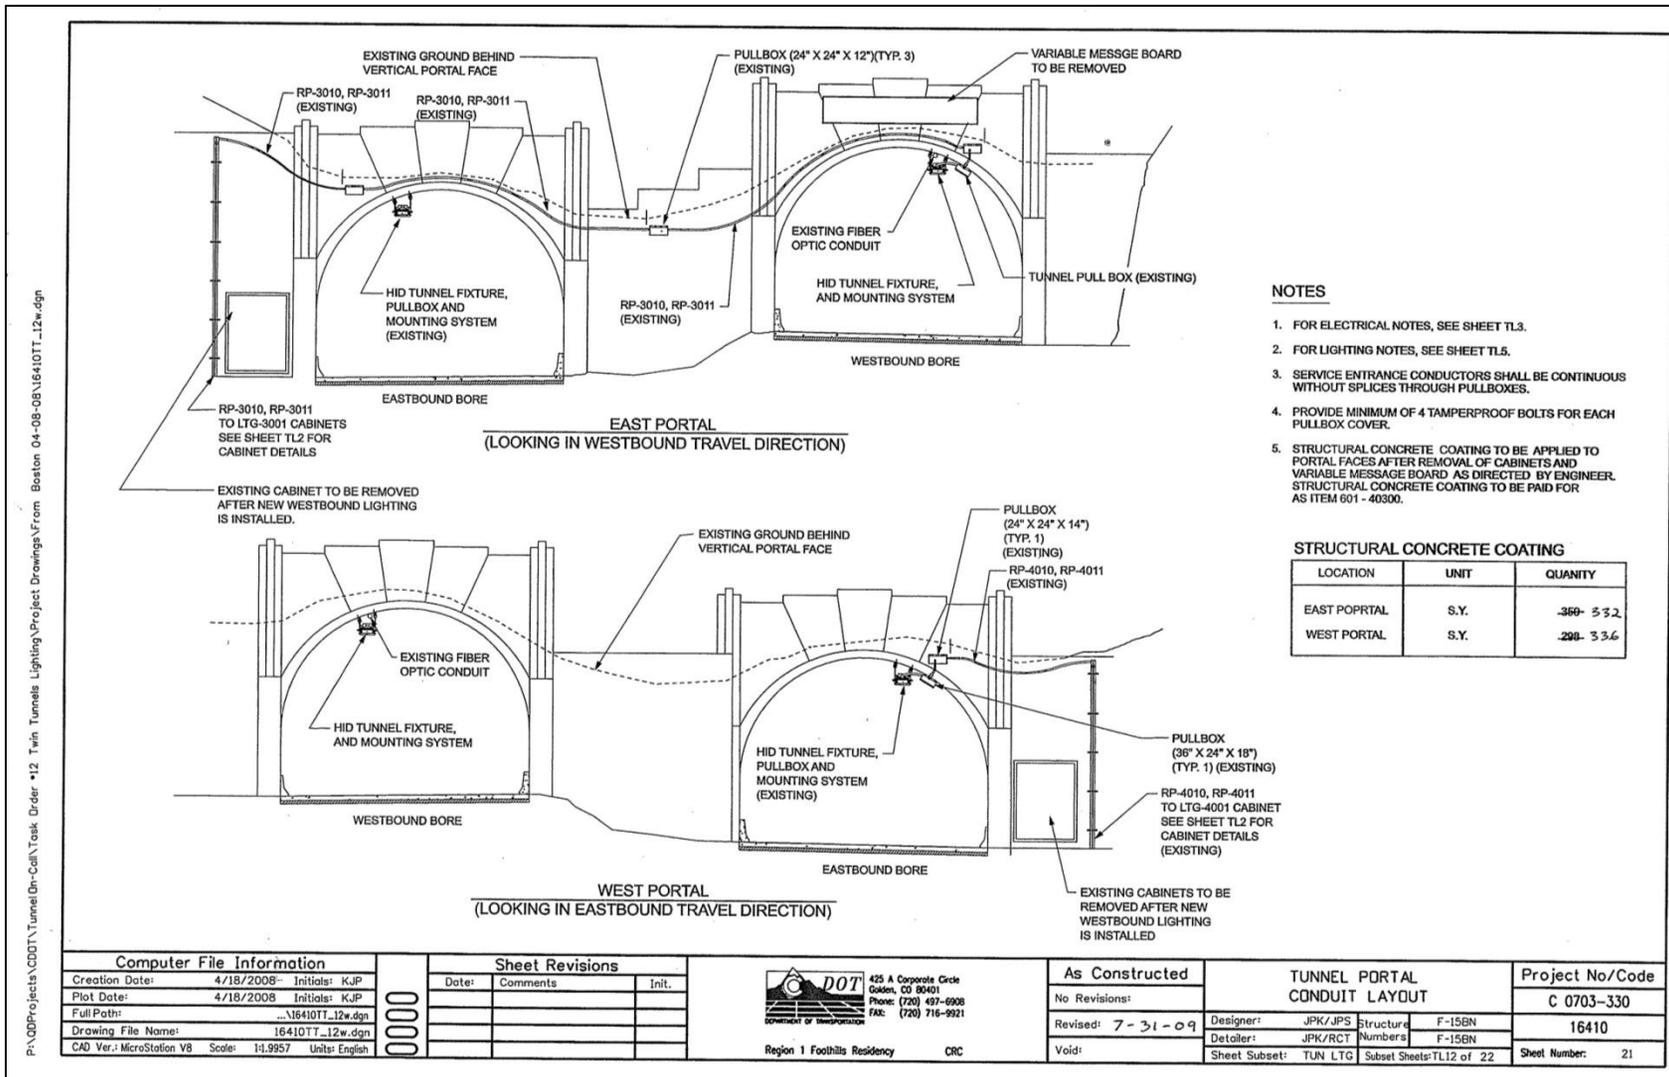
Twin Tunnels Lighting Upgrade As Built Plans (Sheet 21). Typical tunnel sections and proposed lighting.
